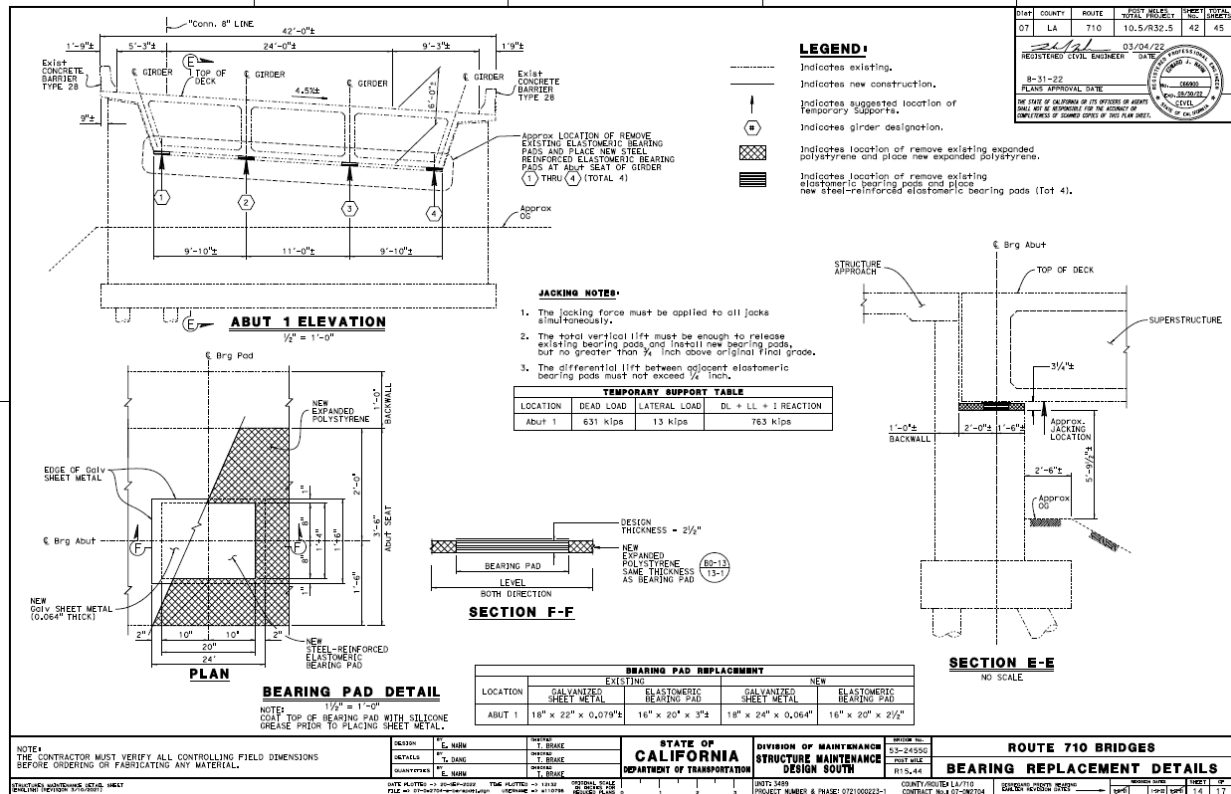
Example of Typical Bearing Replacement Details Sheet
